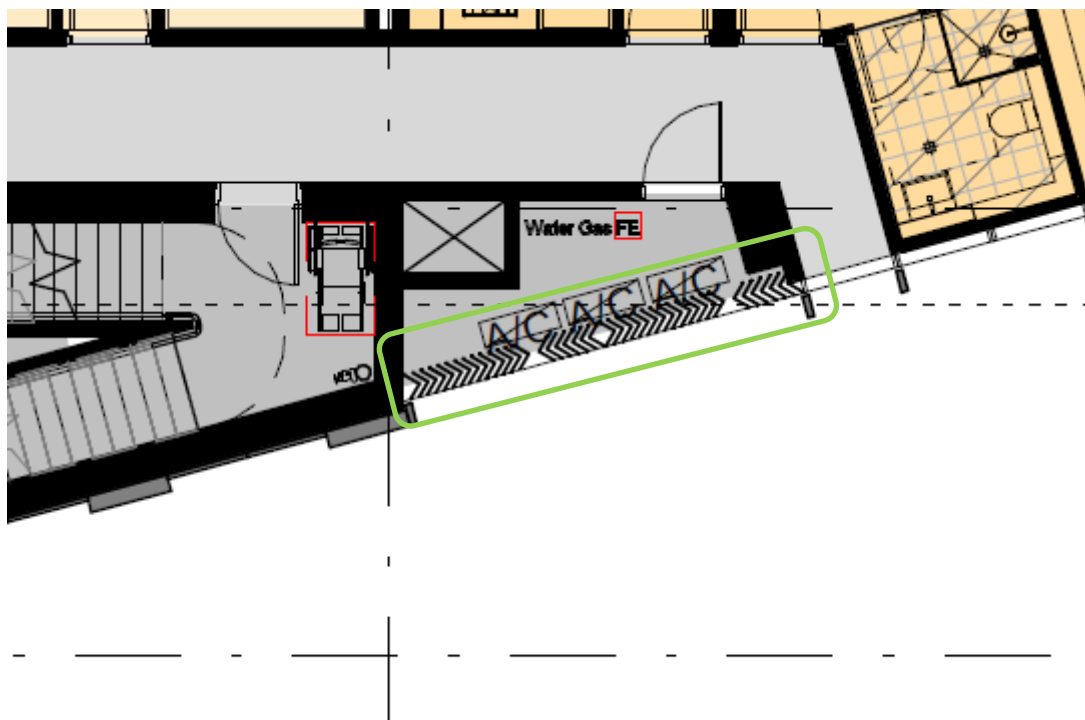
Proposed open aluminium louvres to the plant room on Level 09
